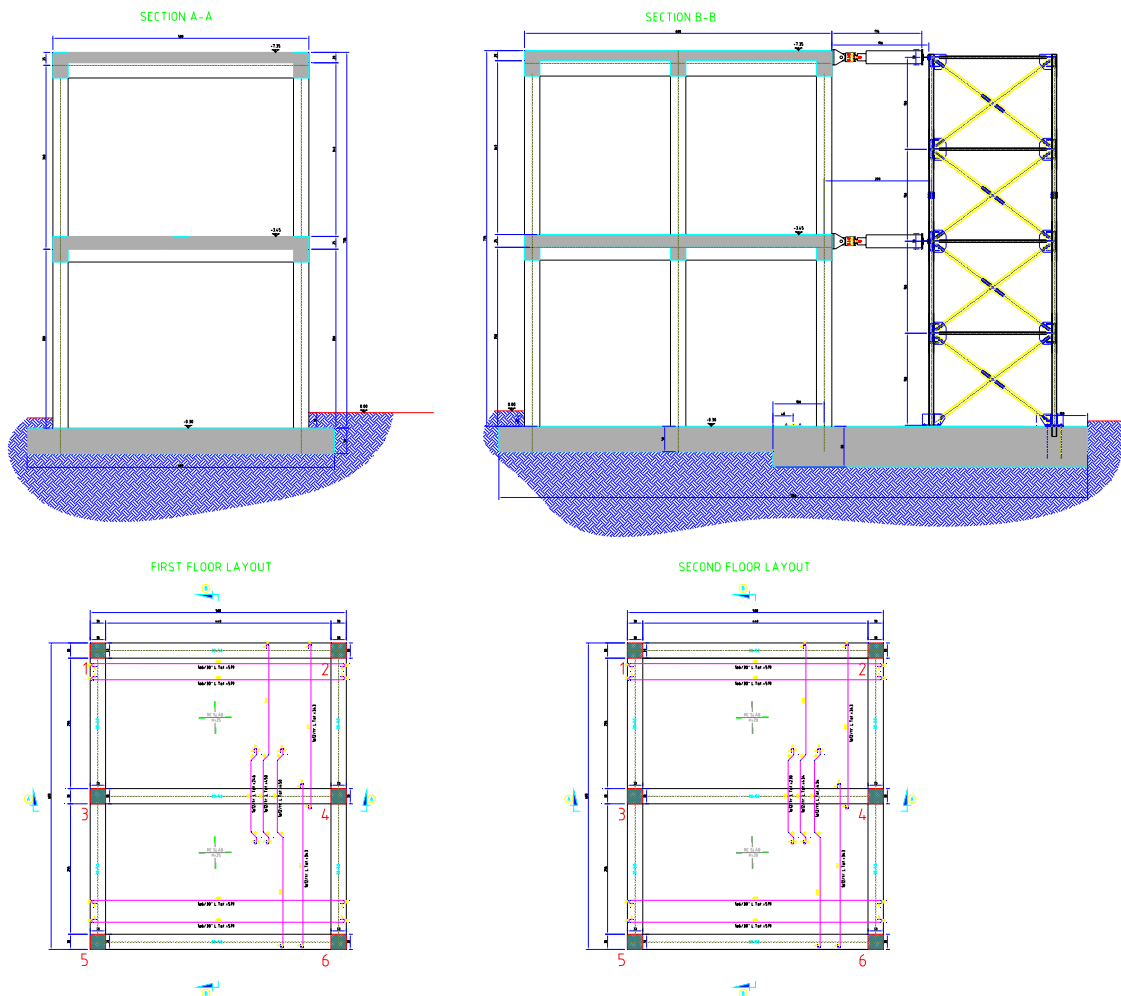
Cross-sections (*top*) and plan layouts (*bottom*) of the sample two-storey RC frame
